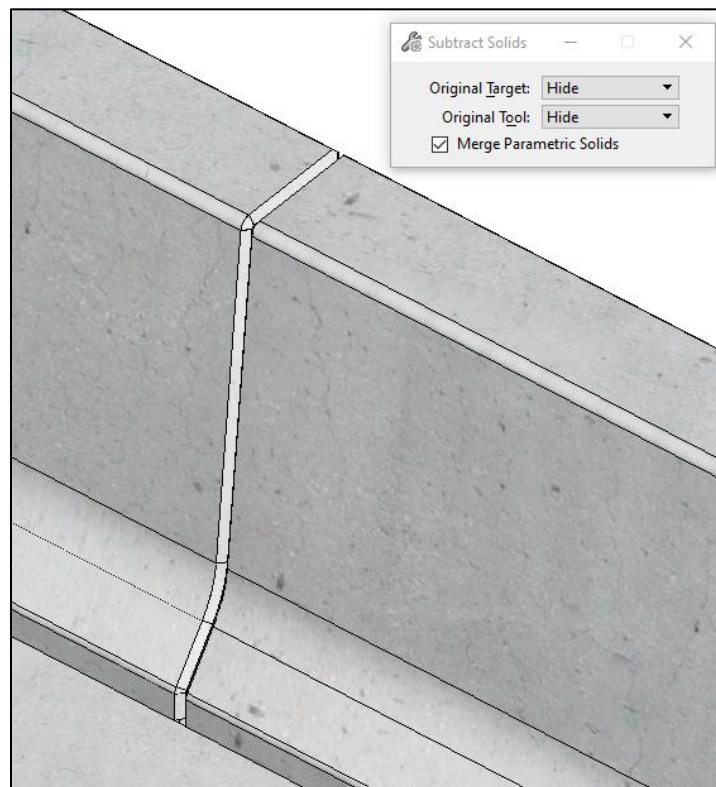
Barrier After Subtracting Deflection Joint
